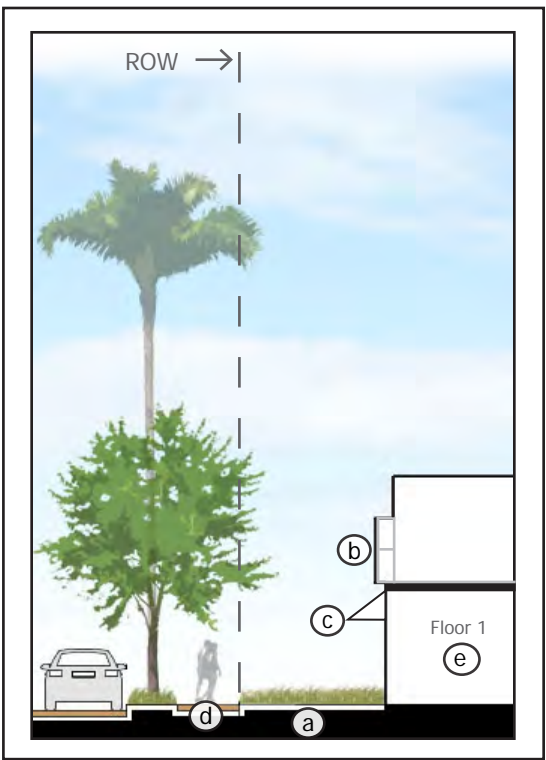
BUILDING PLACEMENT STANDARDS
